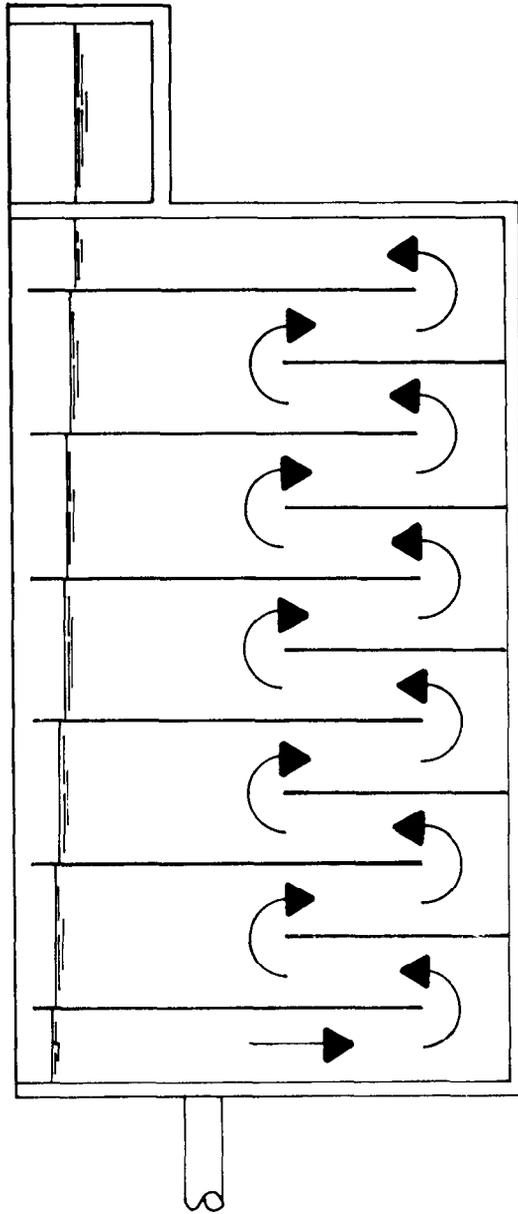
OVER AND UNDER BAFFLED RAPID MIXING BASIN (ELEVATION)
